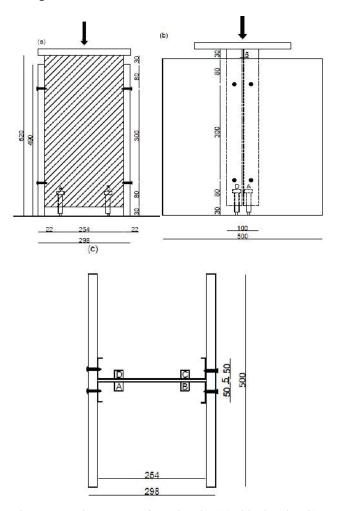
Connection test setup front elevation (a), side elevation (b), and plan view (c)
